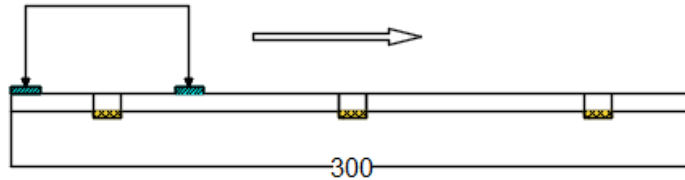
The placement of HL-93 load on the deck slab with 9 ft girder spacing (with two cells) (first combination).
